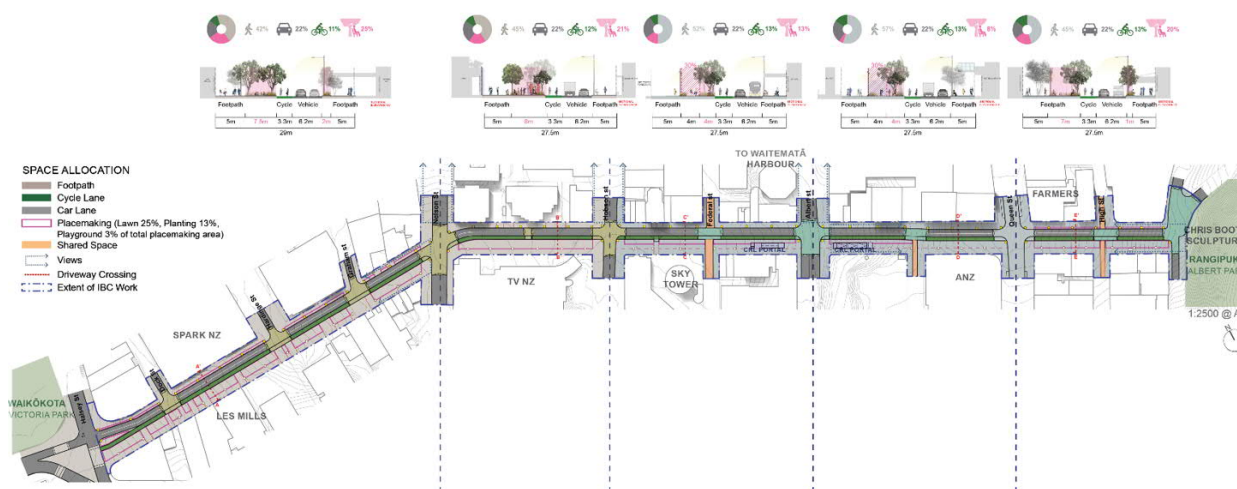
Short List 1 overall layout (larger image provided in Appendix I)³
